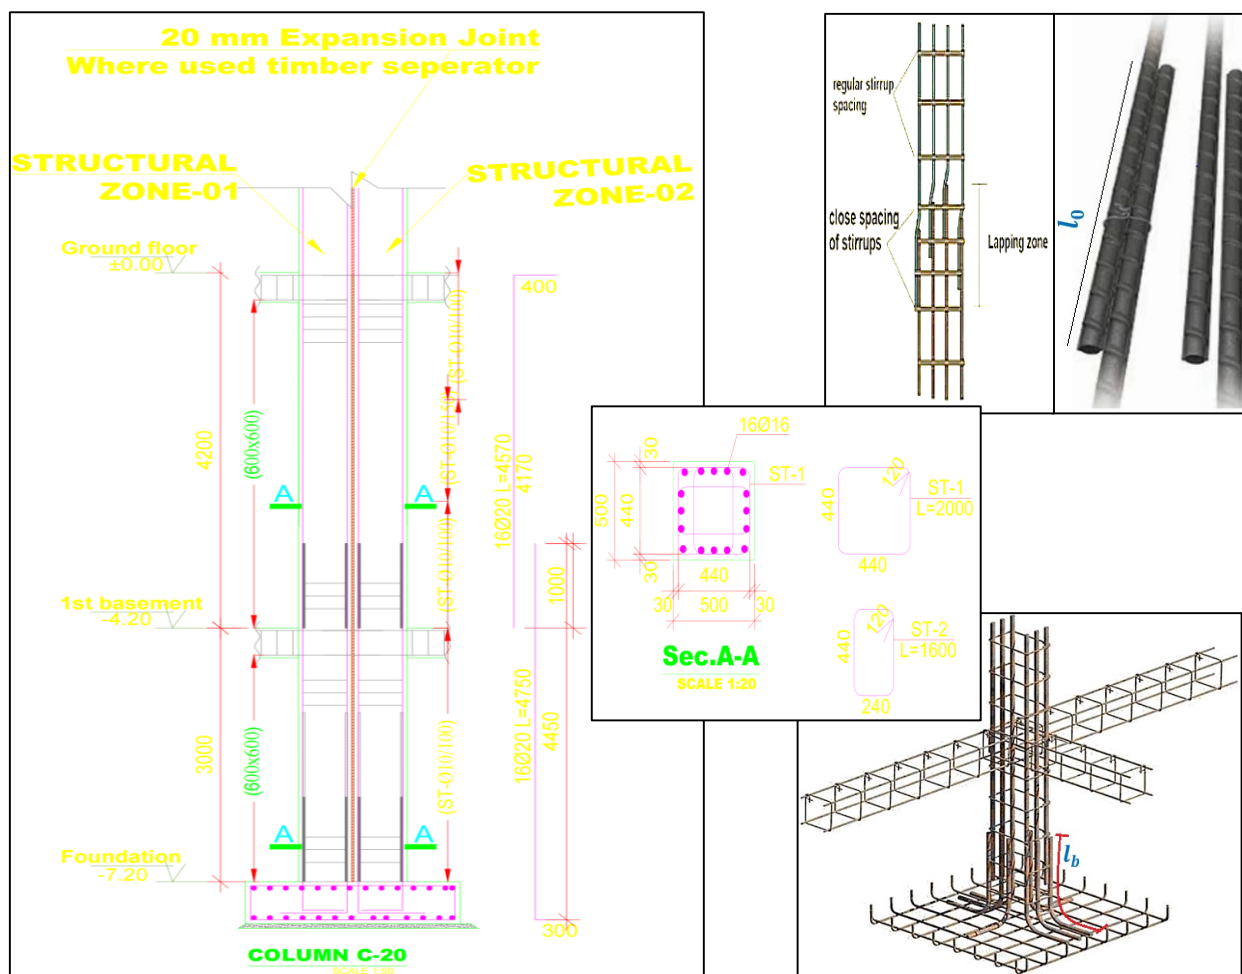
Expansion Joint and Lap Length Layout for Column C-20 of MHB.
